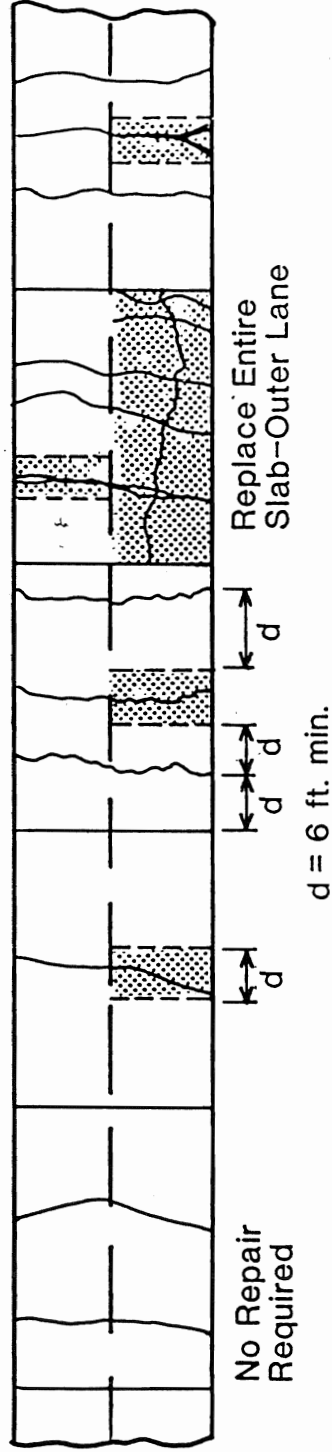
Recommended Full-Depth Repair Designs for Jointed Plain Concrete Pavements.
